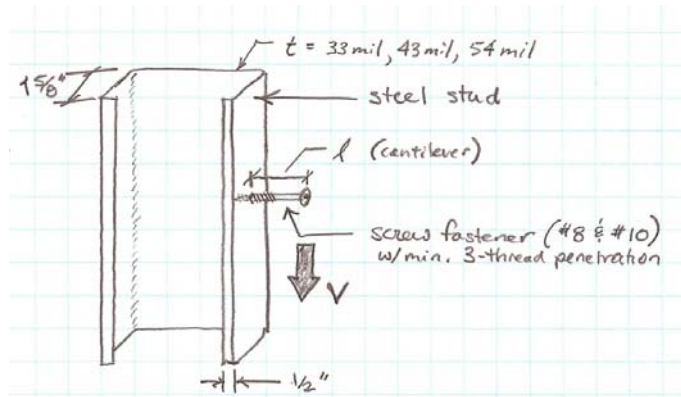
Test configuration for cantilevered screw fastener into the center of the flange of a steel stud.
